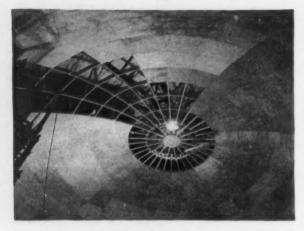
and 3 Internal and external view of prefabricated timber workshop at Stillington
